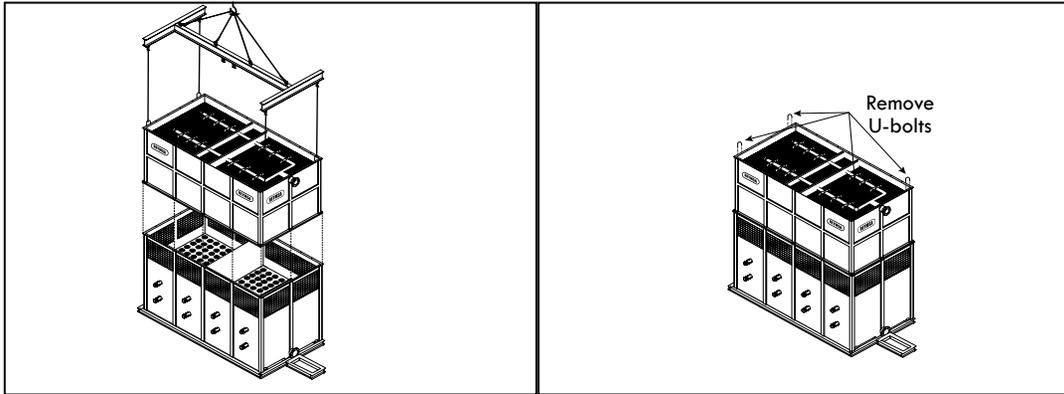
Upper Body Section INSTALLATION for HFC-F models
